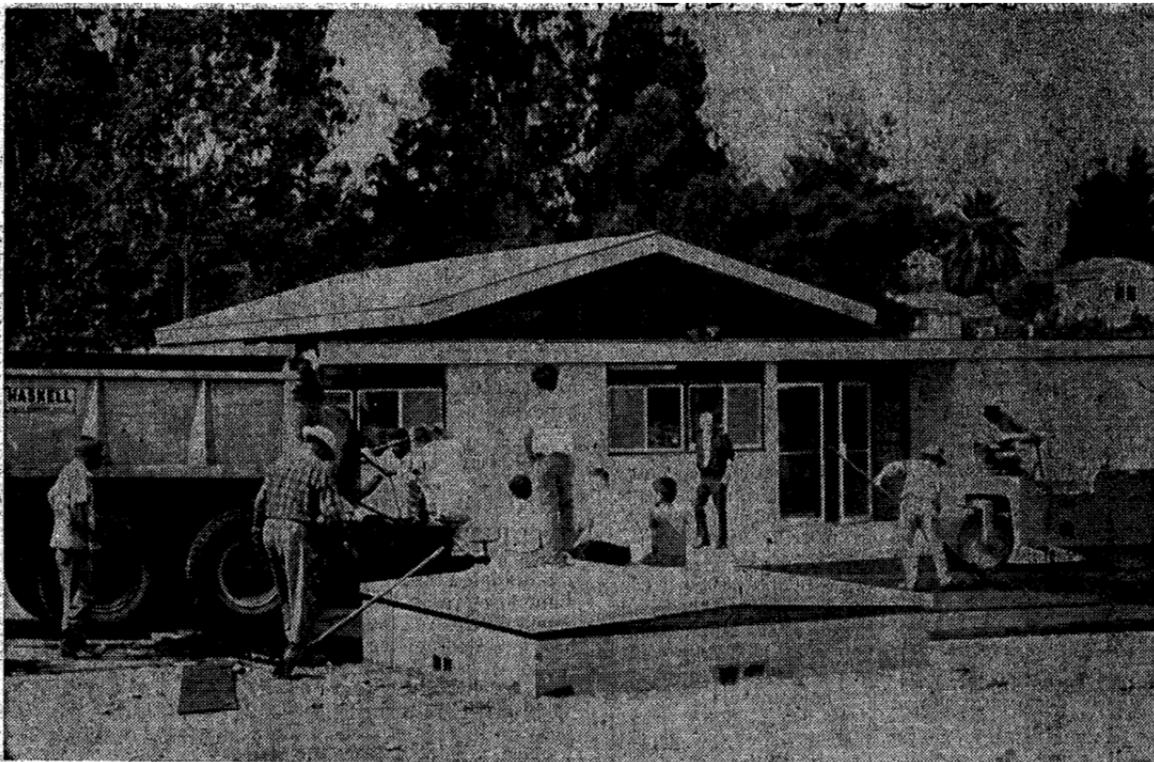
Looking northwest at the south façade facing West Anapamu Street.
